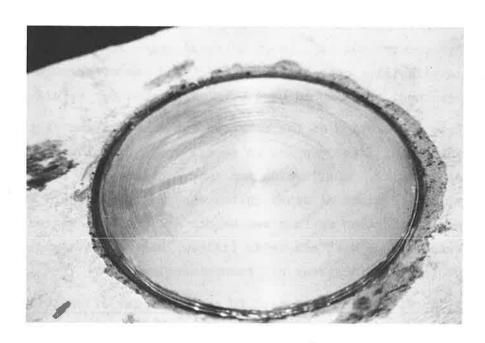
BEARING PLATE INSTALLED FLUSH WITH CROSSTIE BOTTOM SURFACE
